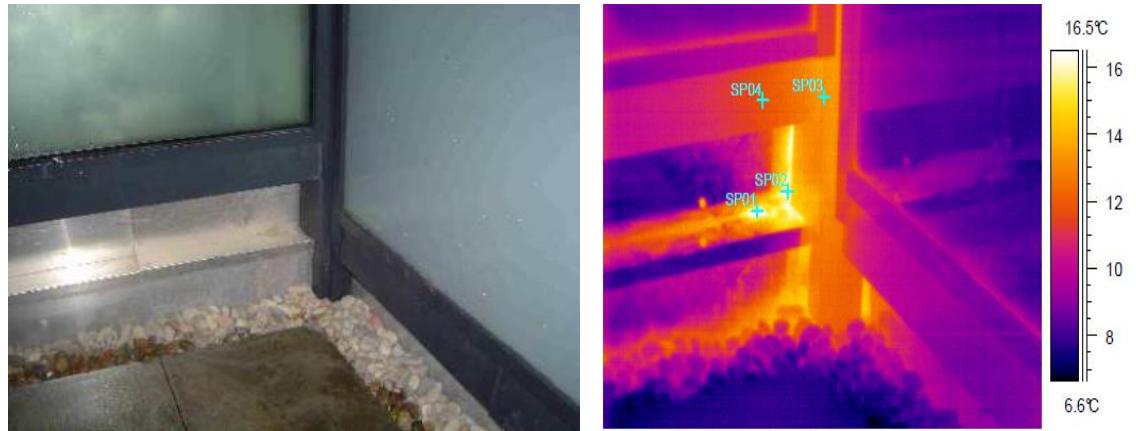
An optical and digital image of the plant room external wall. Evidence of air-leakage through a possible gap in the joints. Heat may also be conducting through one of the support beams creating a thermal bridge between the interior of the plant room and the exterior.
